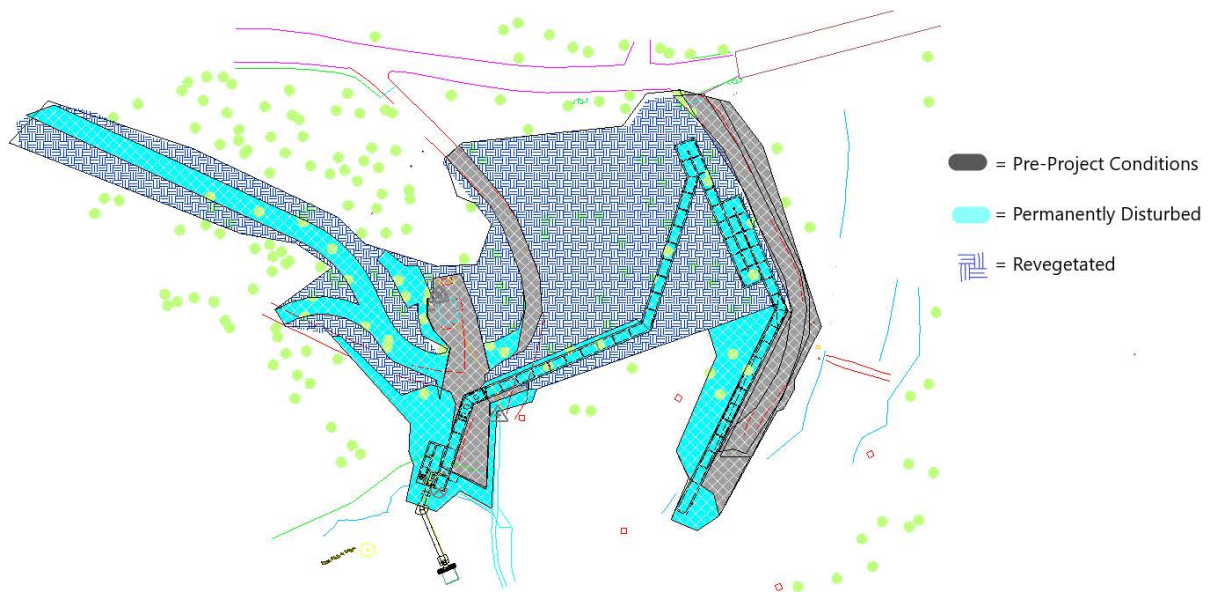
Surface disturbance at construction site of new access roads and fish ladder
